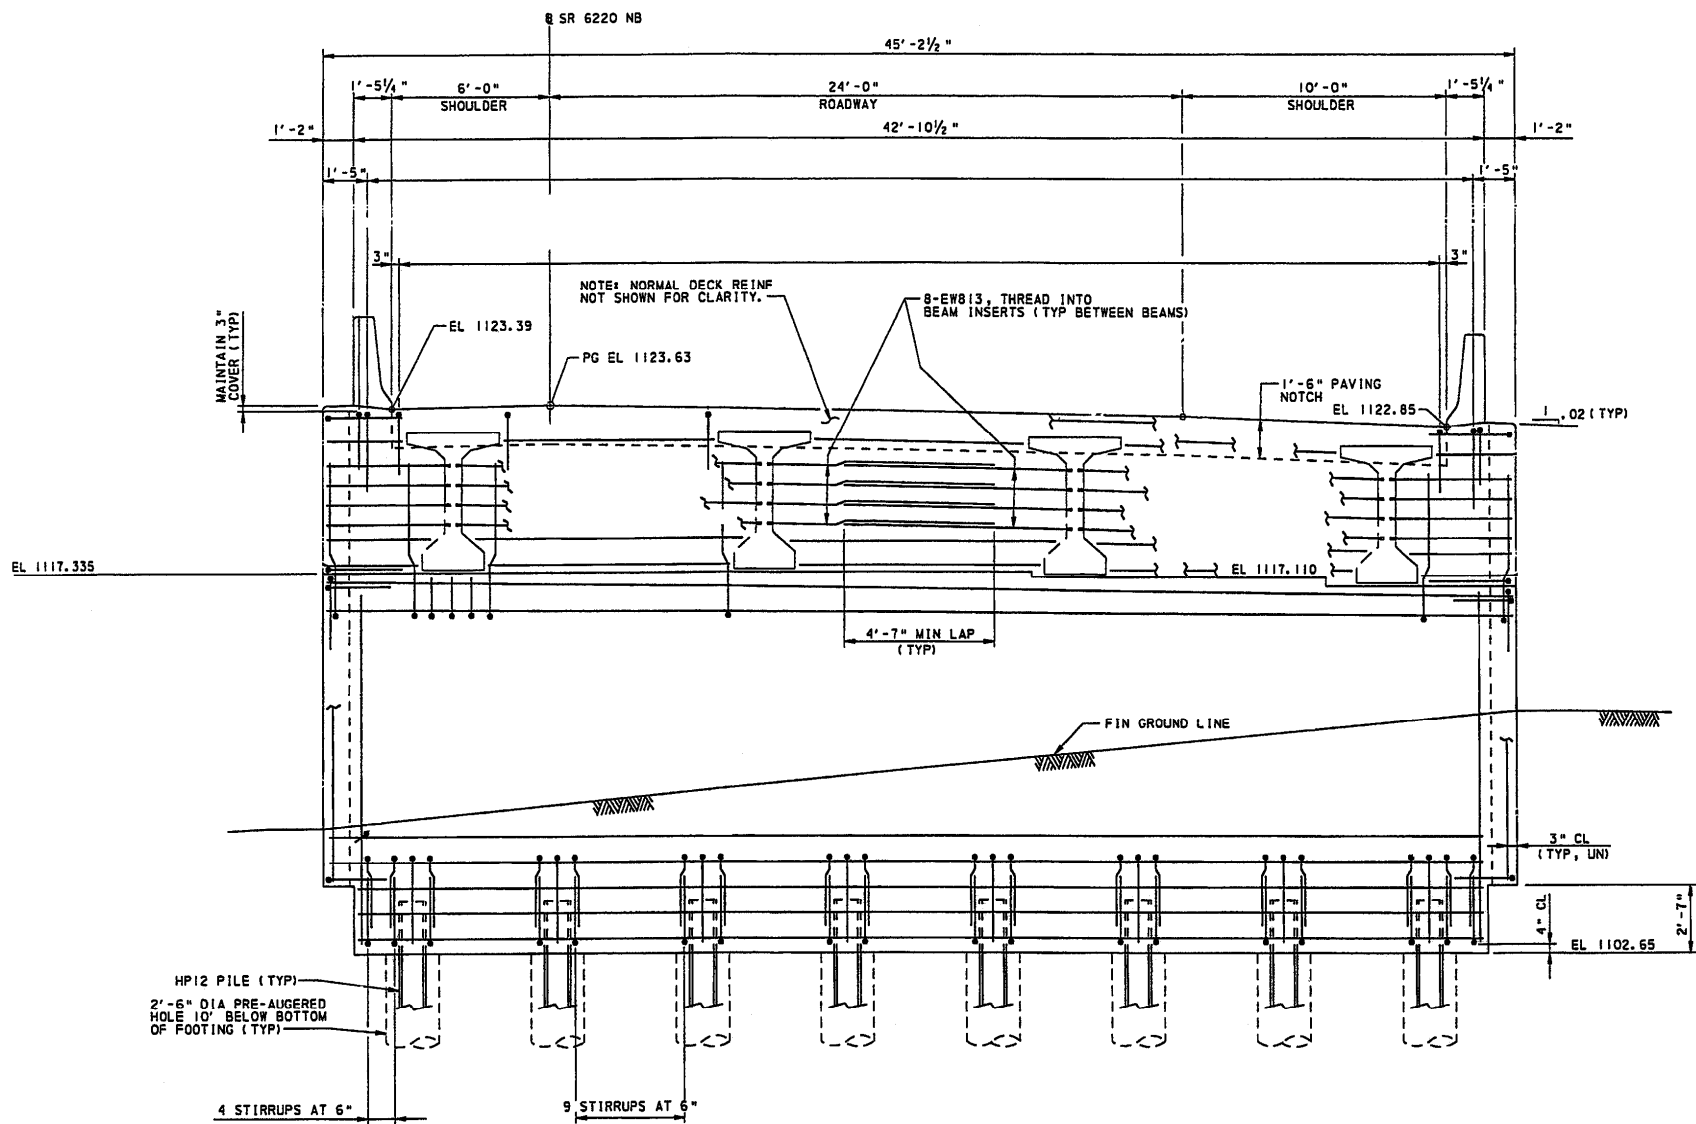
Elevation of Bridge 203 Abutment 2.
